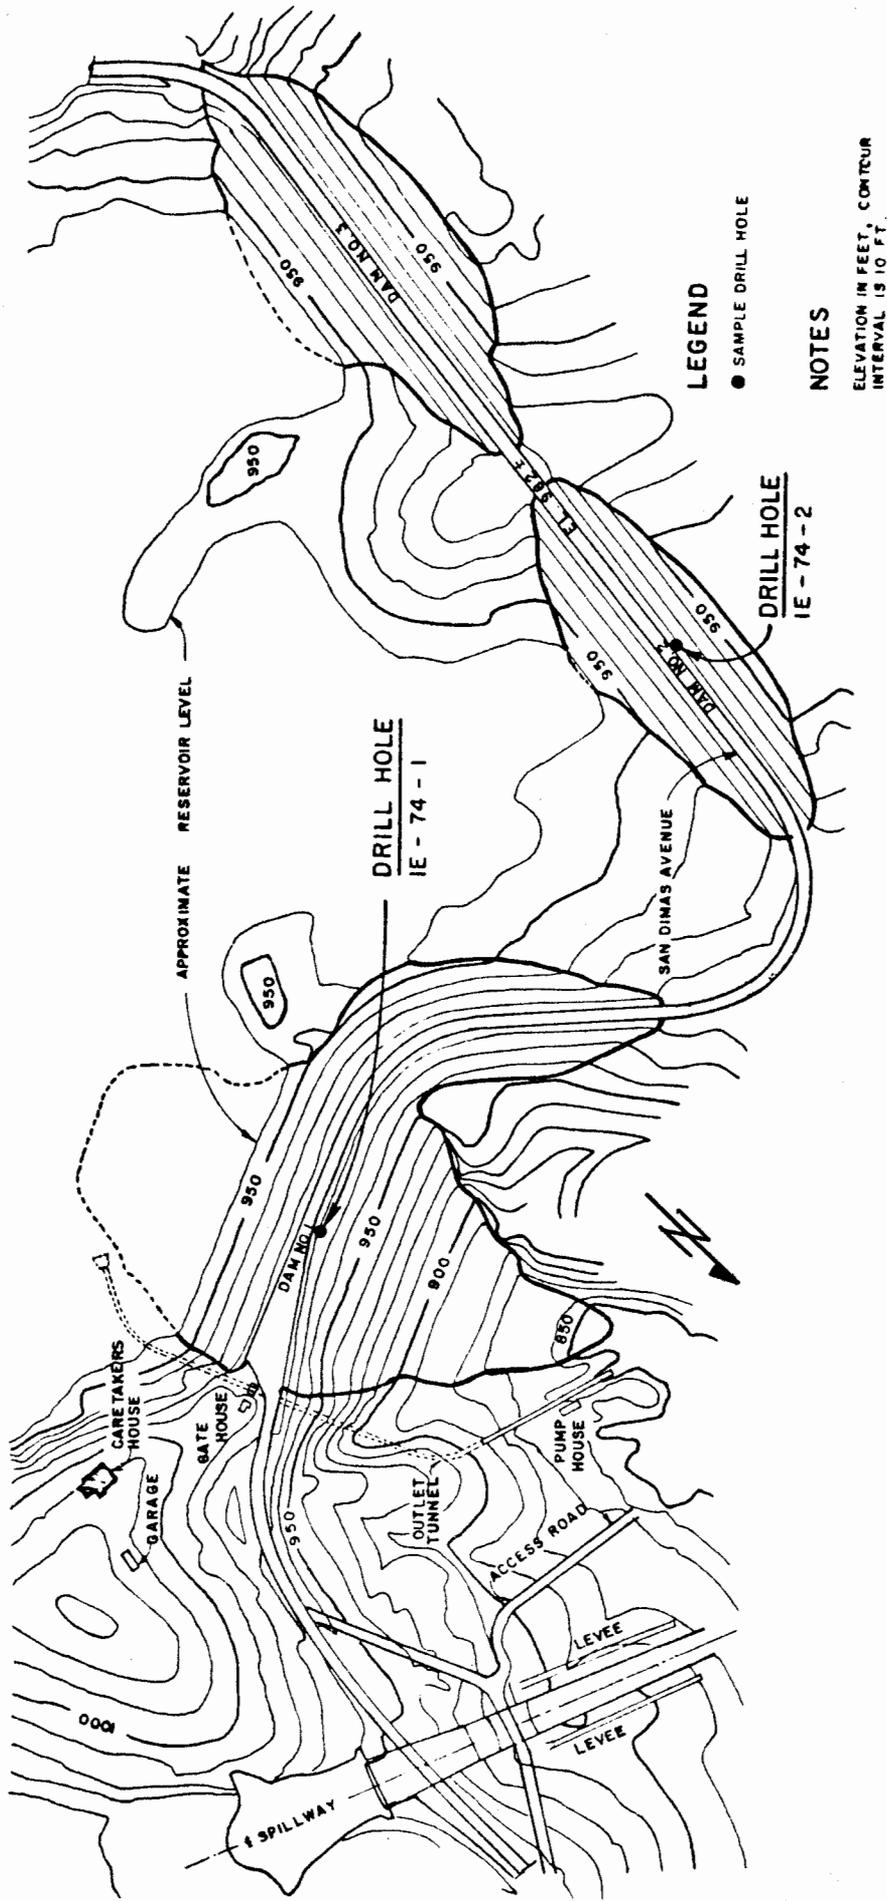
PLAN VIEW OF PUDDINGSTONE DAM (After International Engineering Co., 1973)
